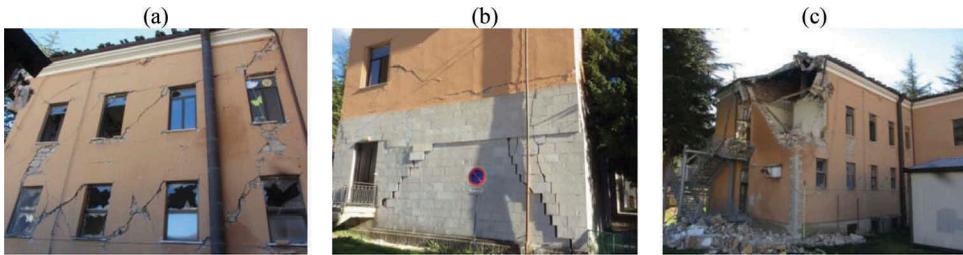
In-plane damage to the NW wall (a) and shear failure of a pier (b); out-of-plane partial collapse of the rear body (c). All photos refer to the damage surveyed on 8th December 2017.
